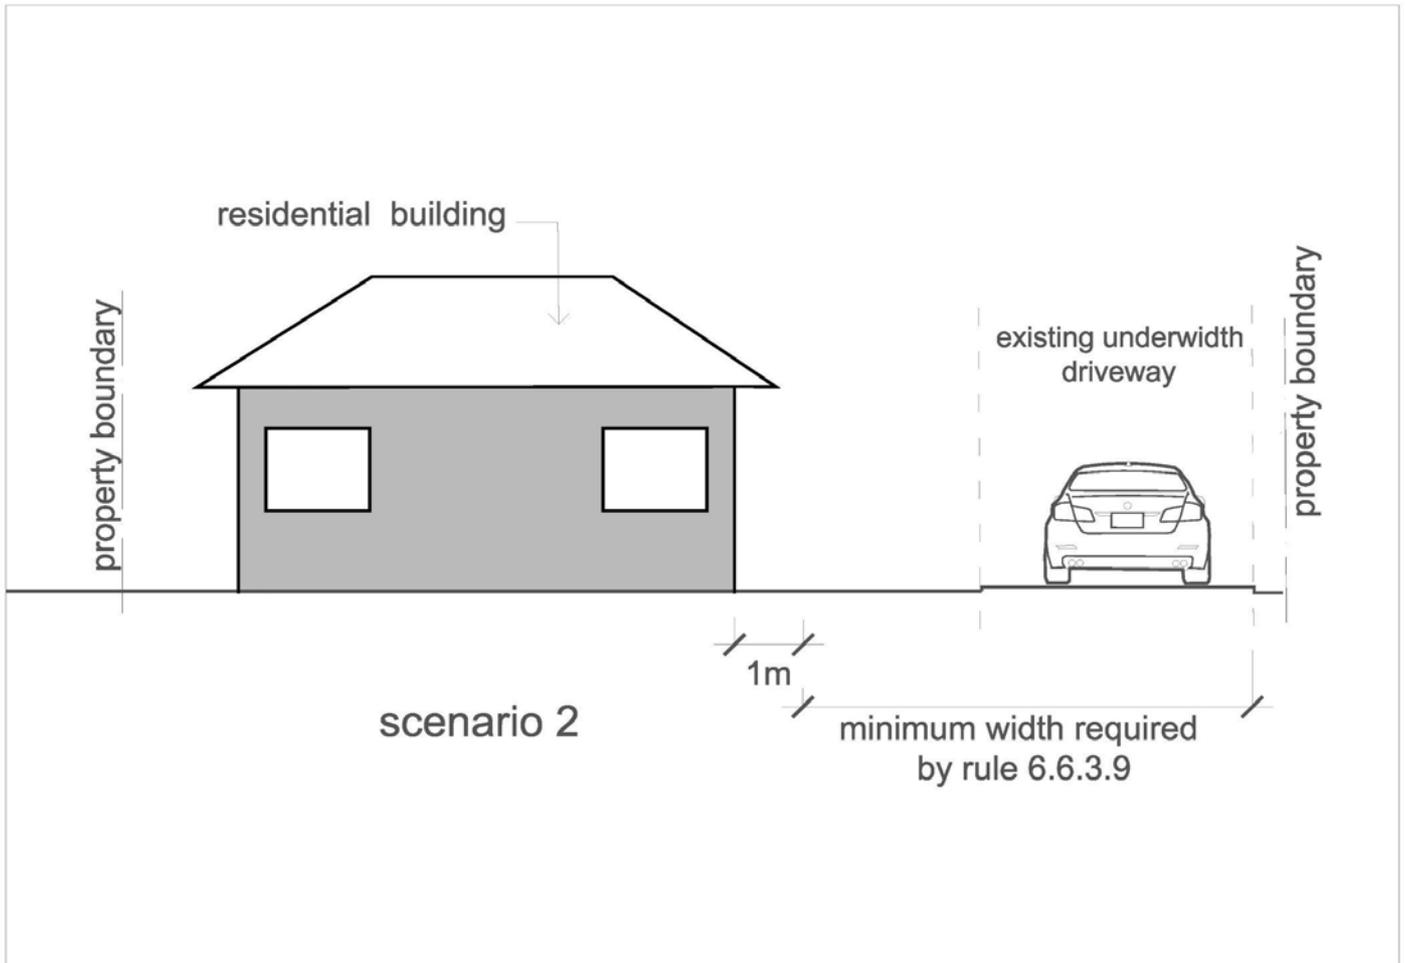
B.4 Minimum separation distance between residential building and driveway
